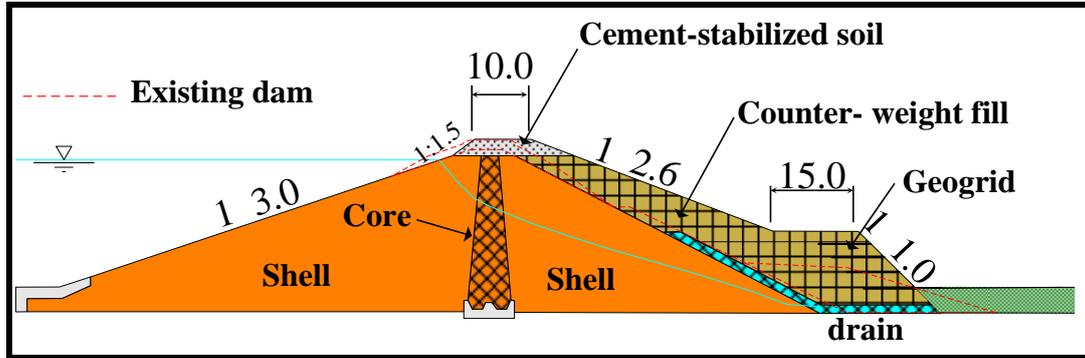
Dam strengthening (Courtesy, Tokyo Metropolitan Government Bureau of Waterworks)
